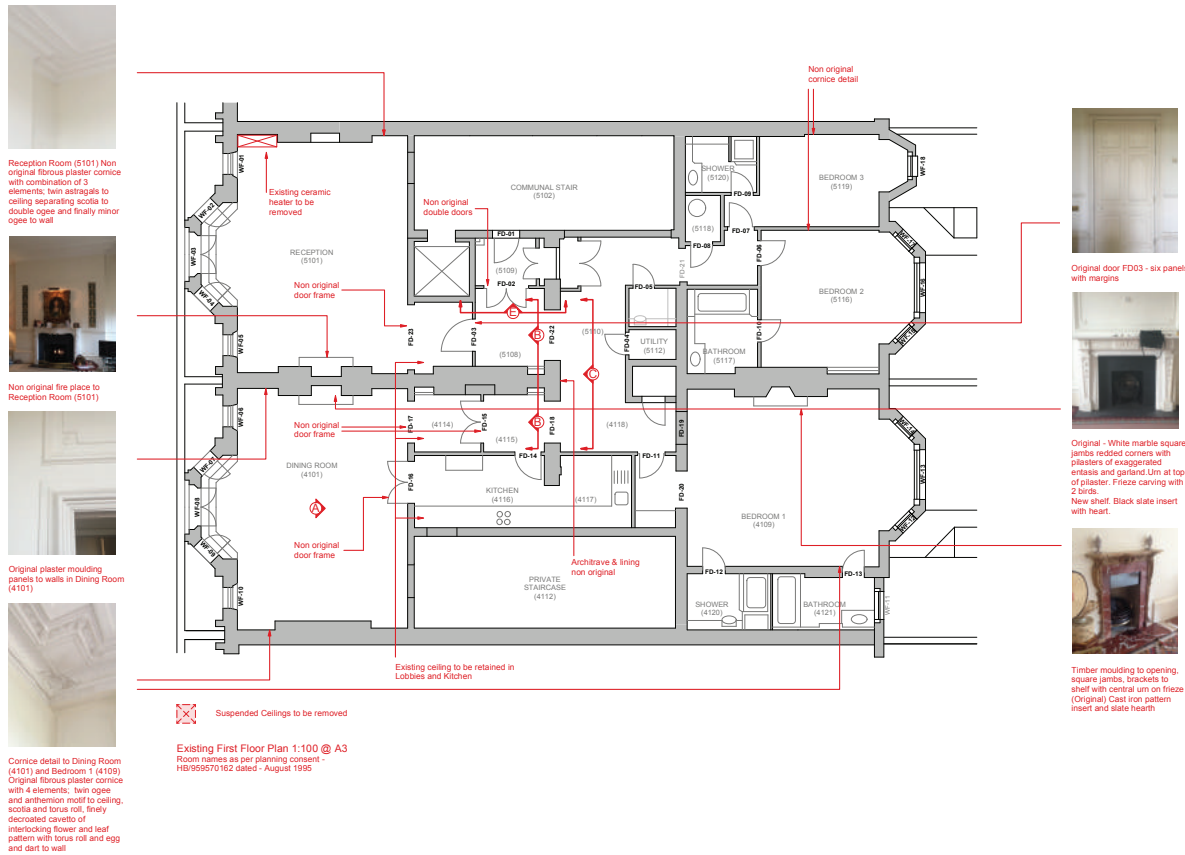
Existing Plan of Flat 2, 5 Cambridge Gate
